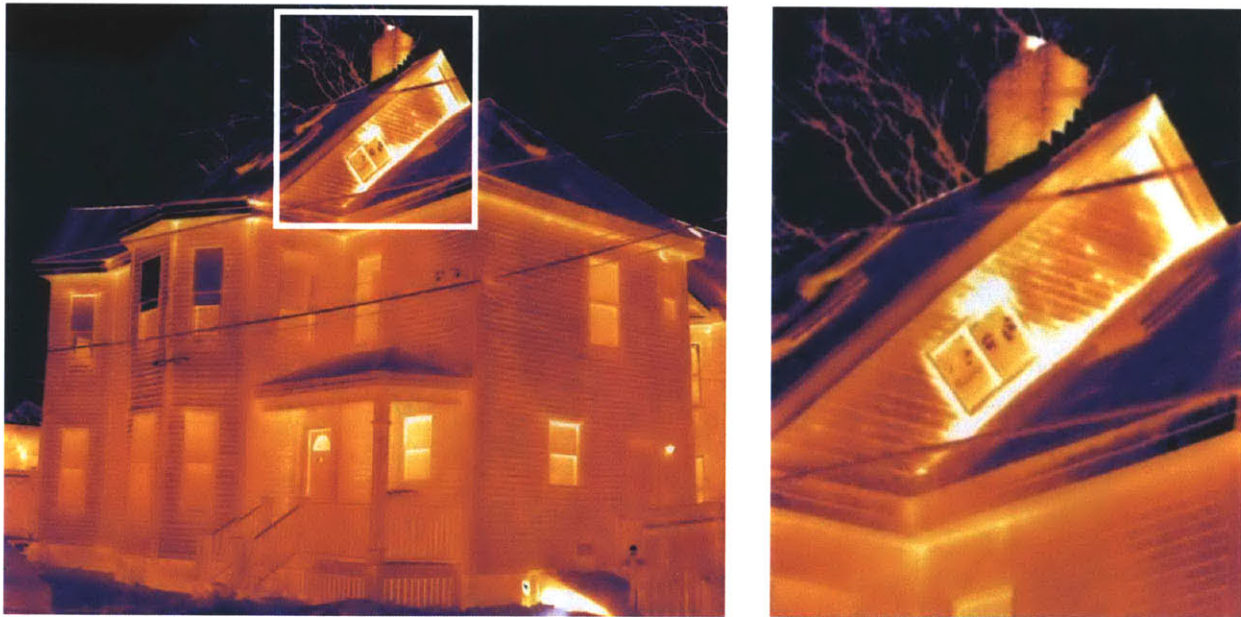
Infrared image of a residential building and a close-up of the roof to highlight heat losses
